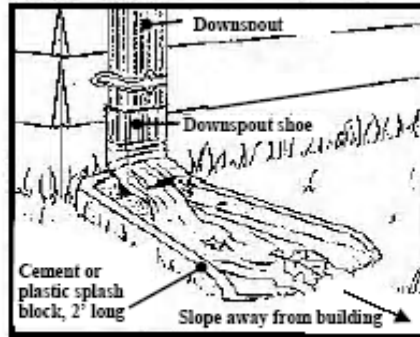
Correct installation of downspout shoe and splash block at foundation wall.
